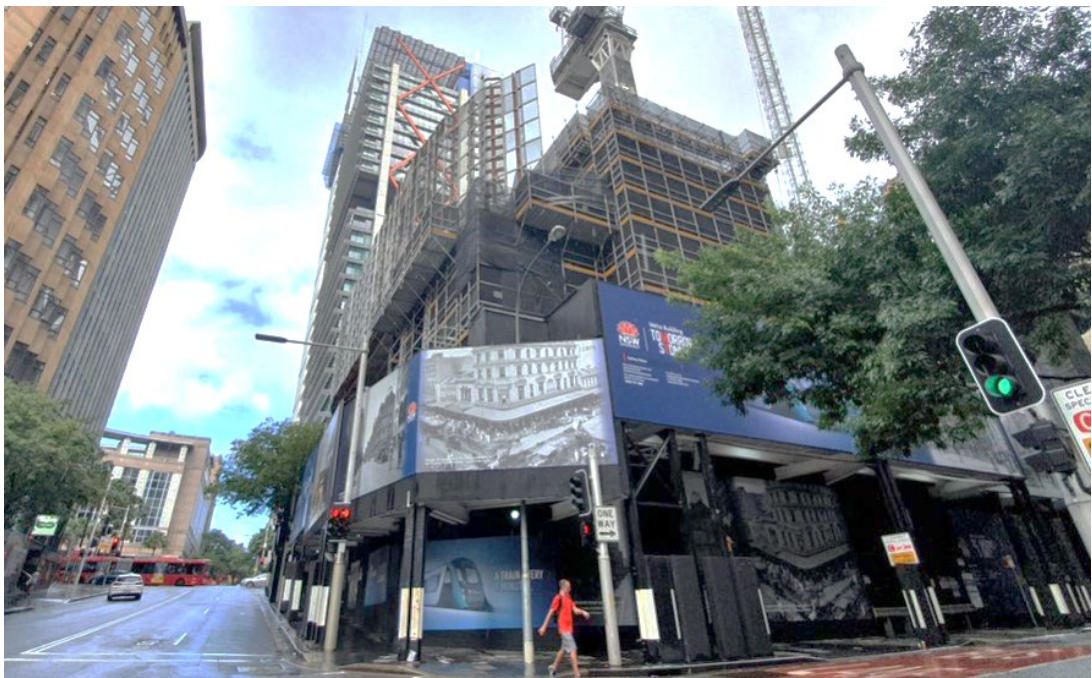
Sydney Metro City & Southwest construction site at corner of Hunter and Castlereagh Streets
